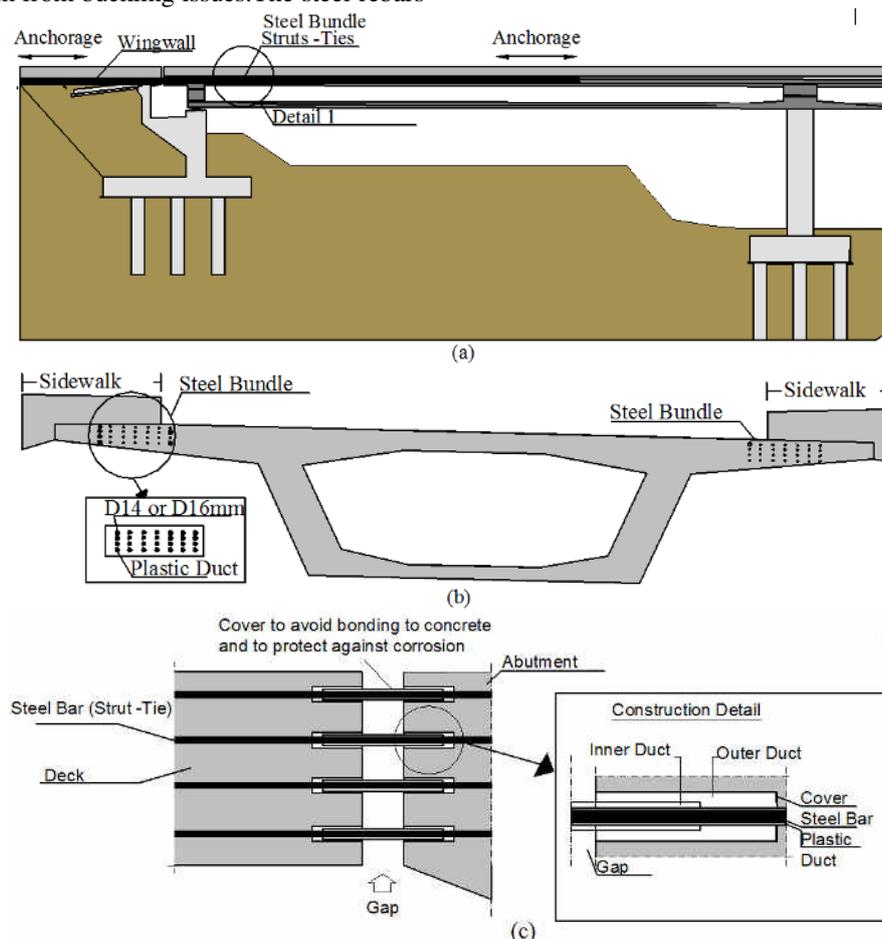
Restraining System. a. Longitudinal view of the bridge, b. Detail 1: cross section of the deck of the bridge, c. Detail at the Expansion Joint between Deck and Abutment
